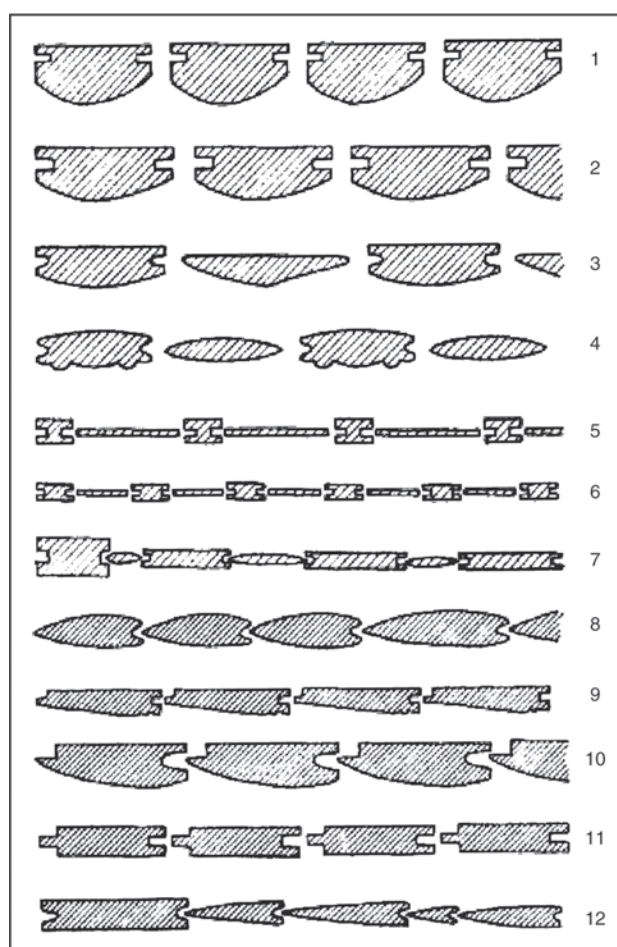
Tongue-and-grooved construction techniques (Chapelot and Fossier 1985, fig. 91)
